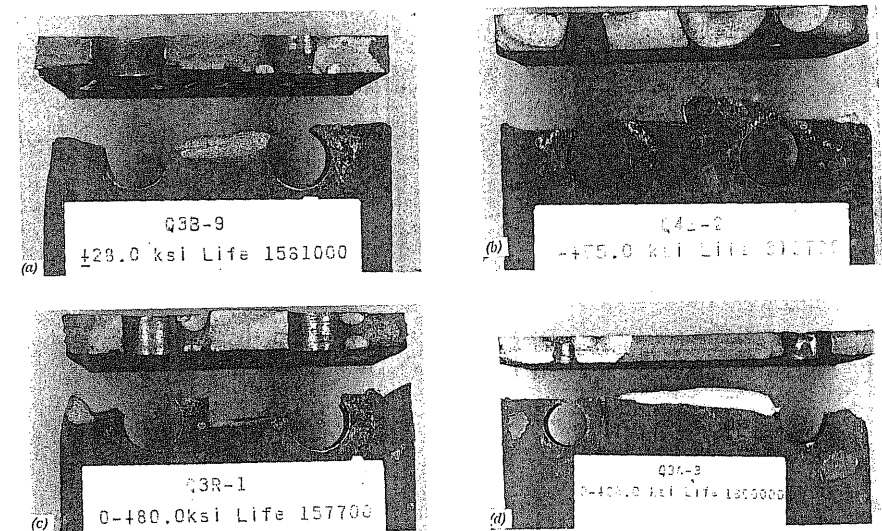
FATIGUE FRACTURES OF A514 STEEL IN BOLTED CONNECTIONS: (a) SPECIMEN Q3B-9; (b) SPECIMEN Q4B-2; (c) SPECIMEN Q3R-2; (d) SPECIMEN Q3A-3
